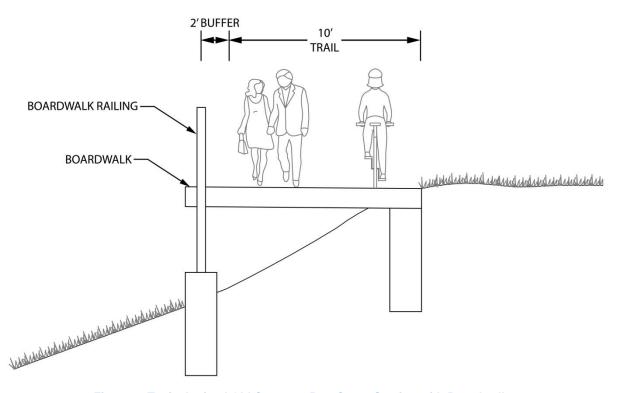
Typical raised Old Cameron Run Cross Section with Boardwalk
